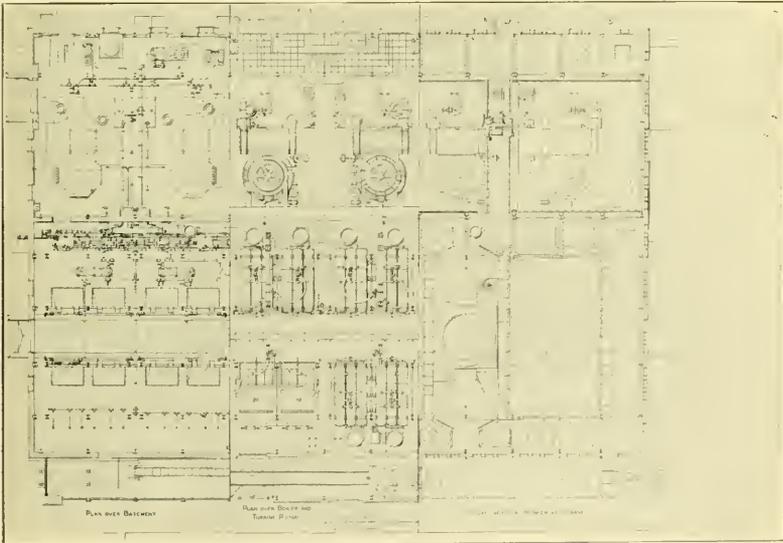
TYPICAL PLAN OF PORT MORRIS POWER STATION.
